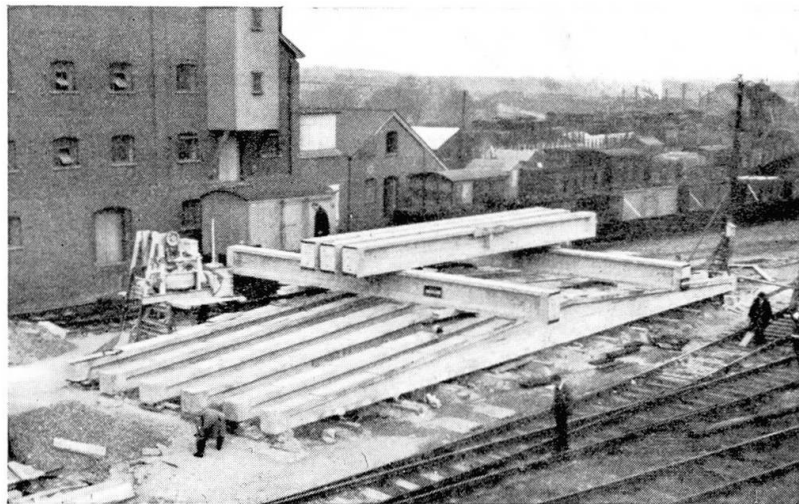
Bury St. Edmunds checking test. Roof beams April 1952
